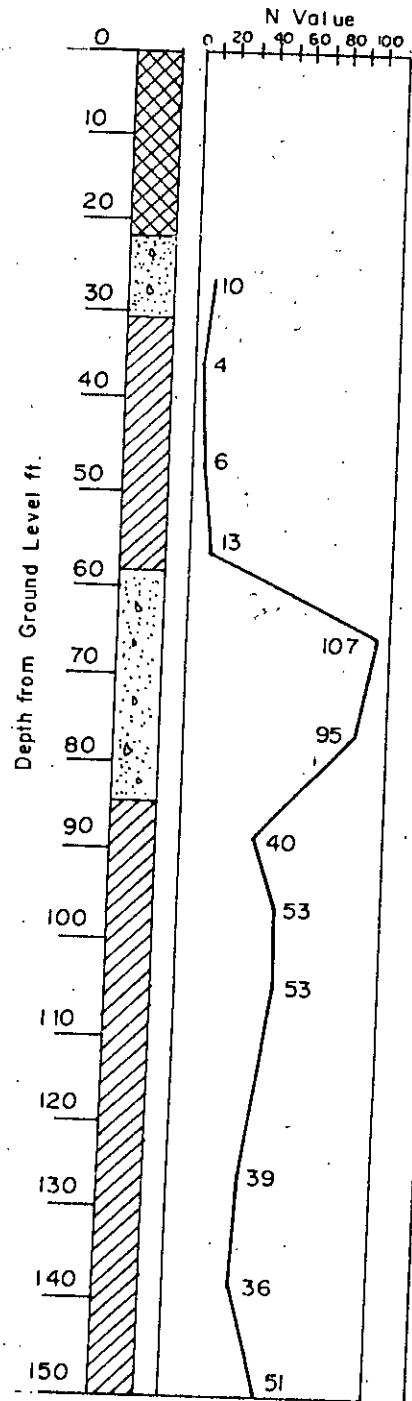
TYPICAL BORING LOG AT MAULVI BAZAR
